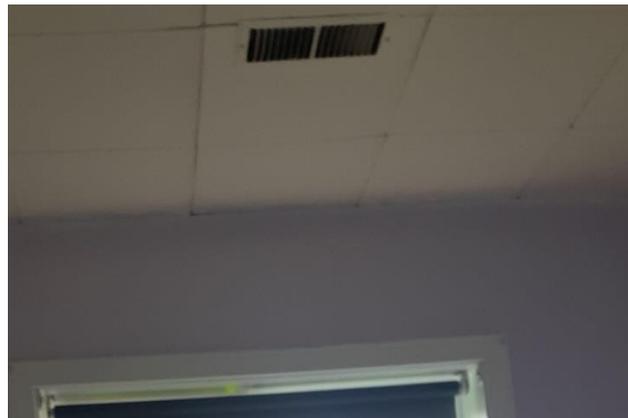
Drop ceiling and forced air heating vent in master bedroom (provided by owner).
